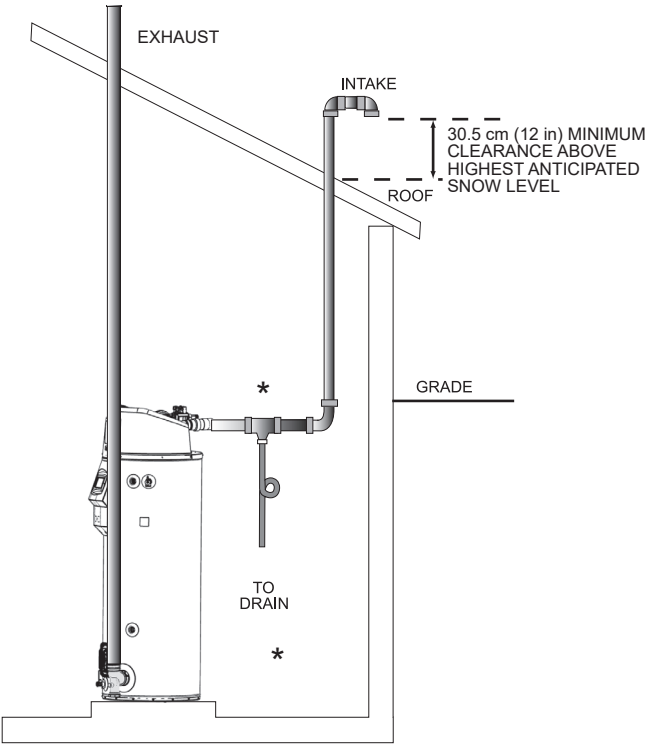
Direct Vent, Pitched Roof, Standard Termination
